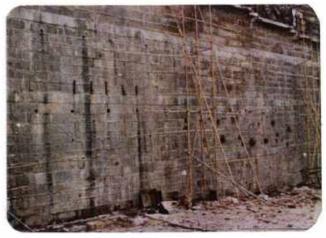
Tied Face Wall with Horizontal Beams (11SW-A/R45)
